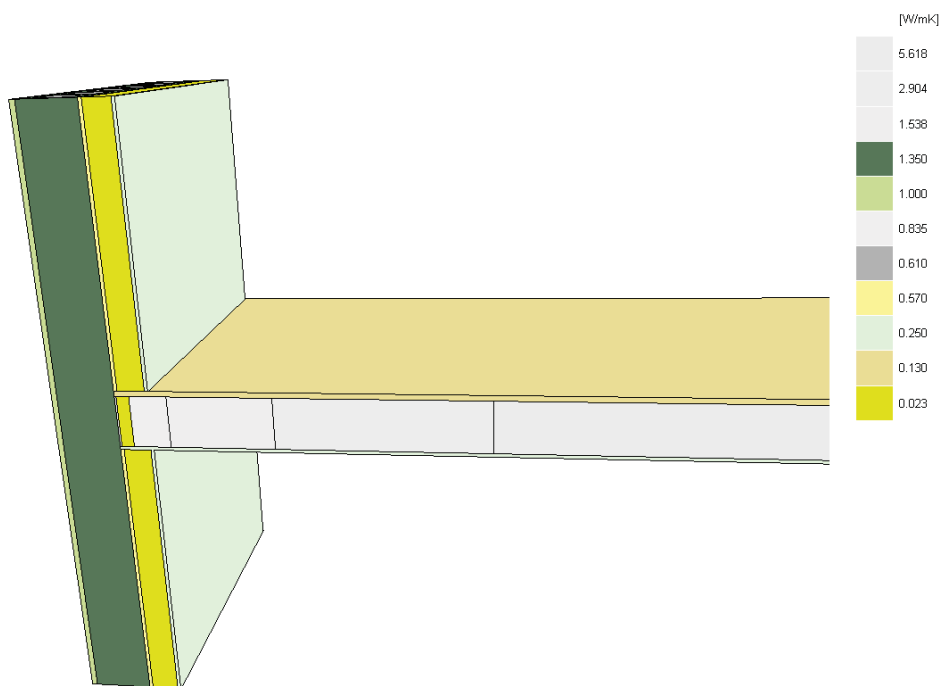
Hollow block wall with IWI, junction with intermediate floor: Materials modelled in TRISCO with insulation between joists
